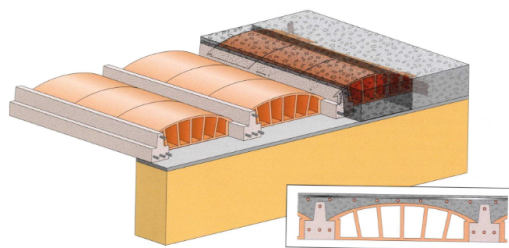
Ceramic blocks supported by concrete prestressed beams (Lopes *et al.*, 2008).
